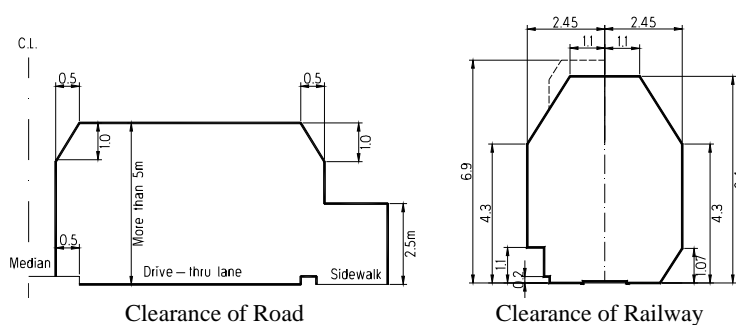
Required Clearance of Road and Railway under Flyover Bridge in Mongolia
